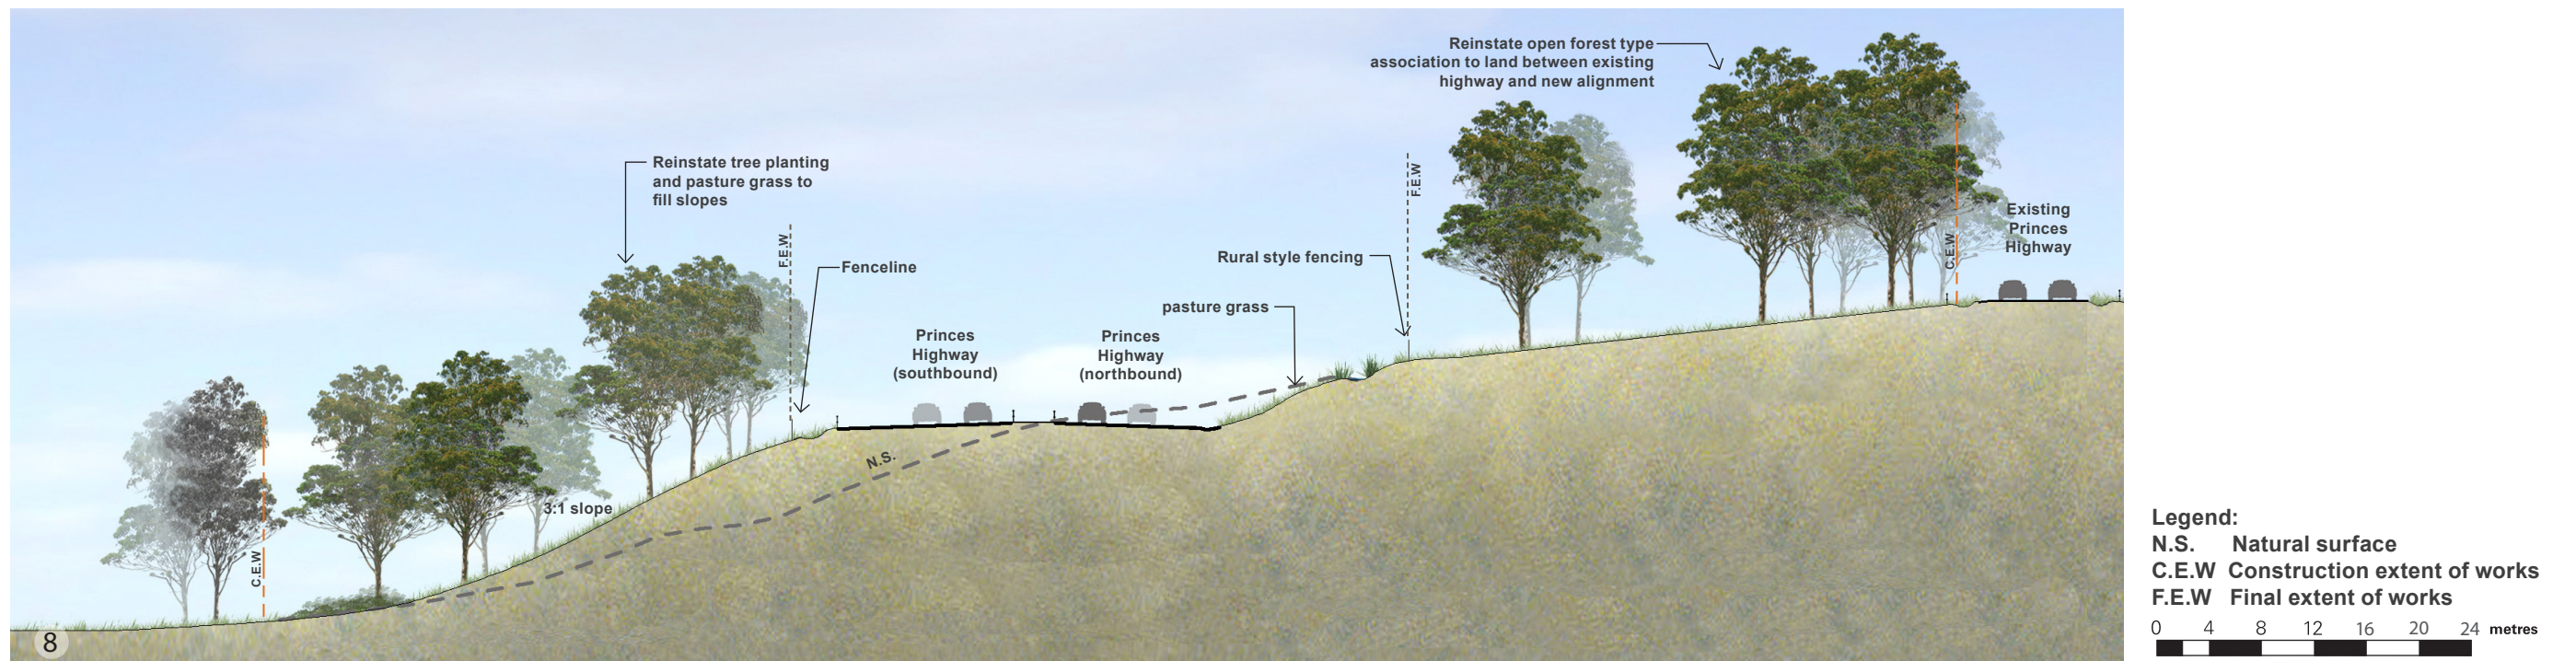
Elevation / section 8 - North Berry - chainage 14150
